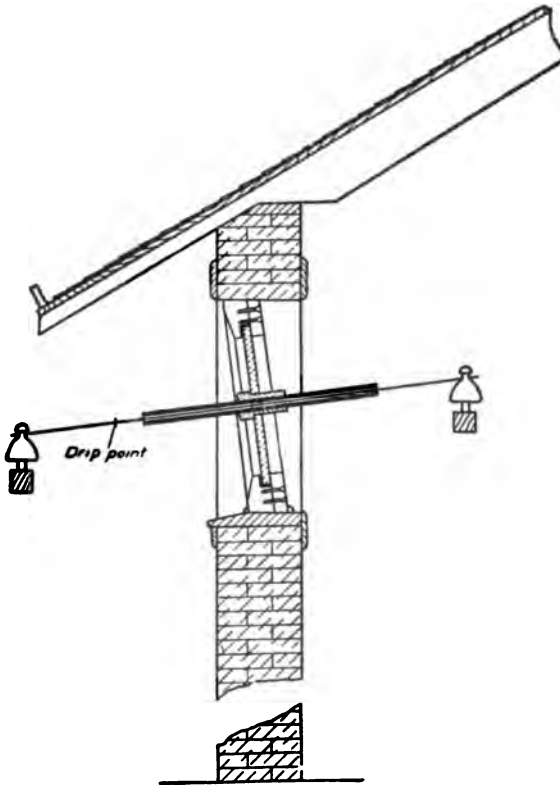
Wall Outlet with a Slab of Insulation Material and Insulating Tube.
